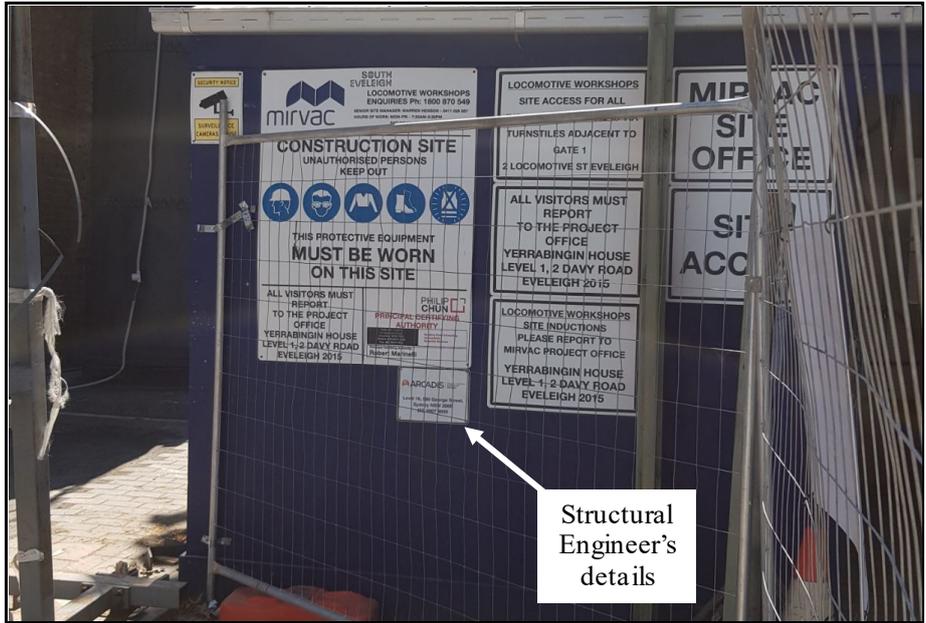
Site Notice at Mirvac Site Office Entrance with Structural Engineer's details
